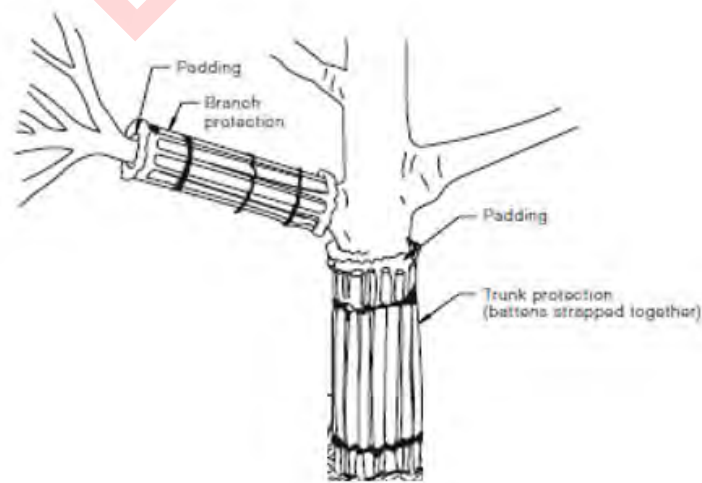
Example of trunk and branch protection (Source: AS 4970-2009).
